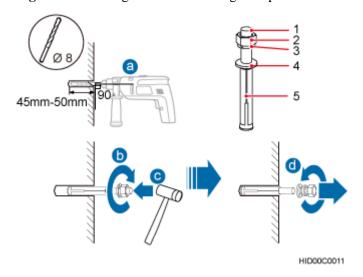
Drilling a hole and inserting an expansion bolt assembly
